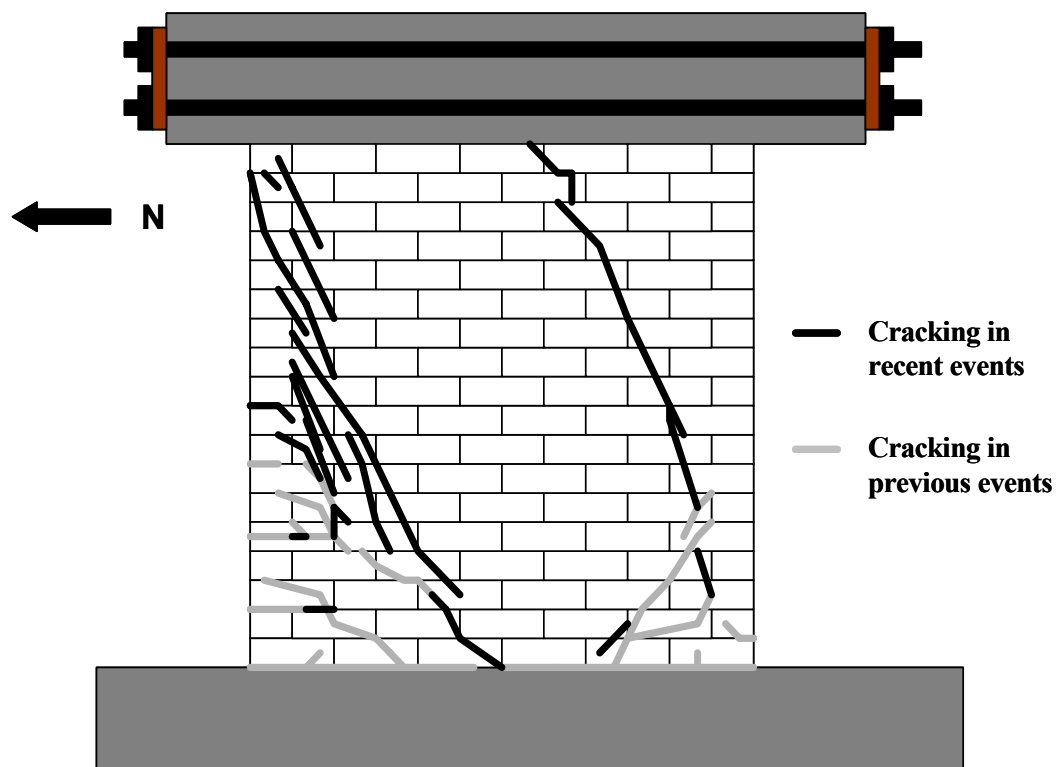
Web-shear cracking in Shear Wall Specimen 18
